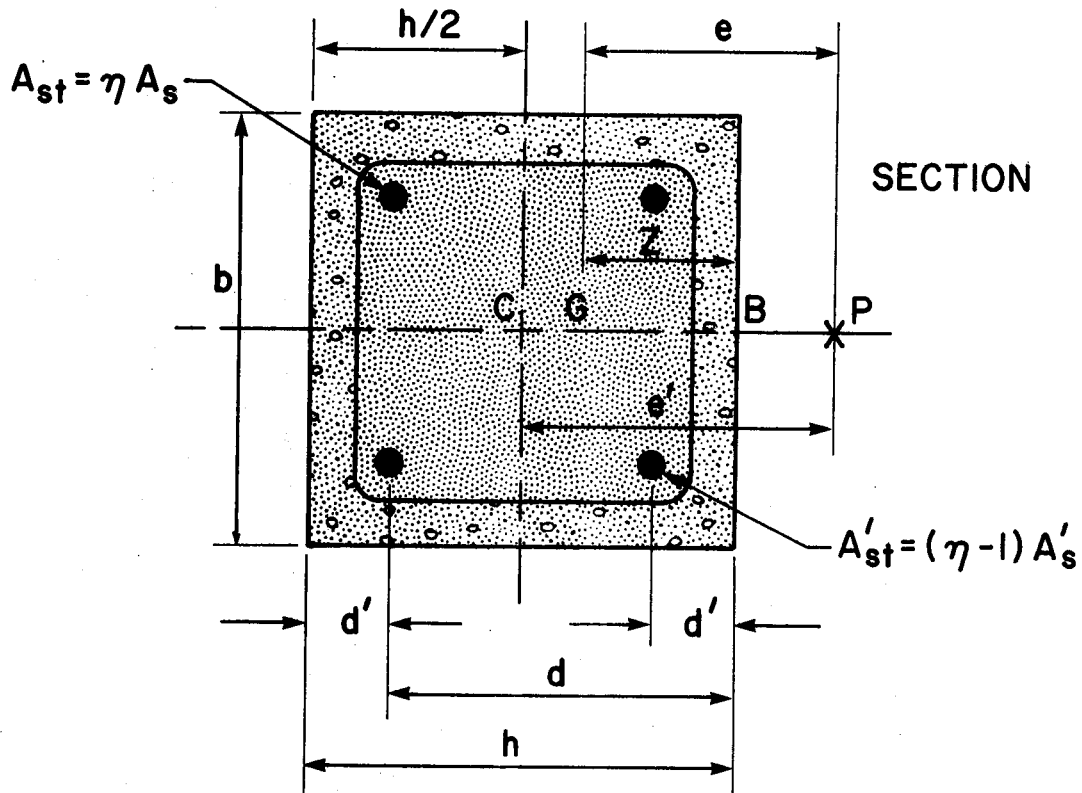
Cracked Reinforced Masonry Column with Eccentric Loading
